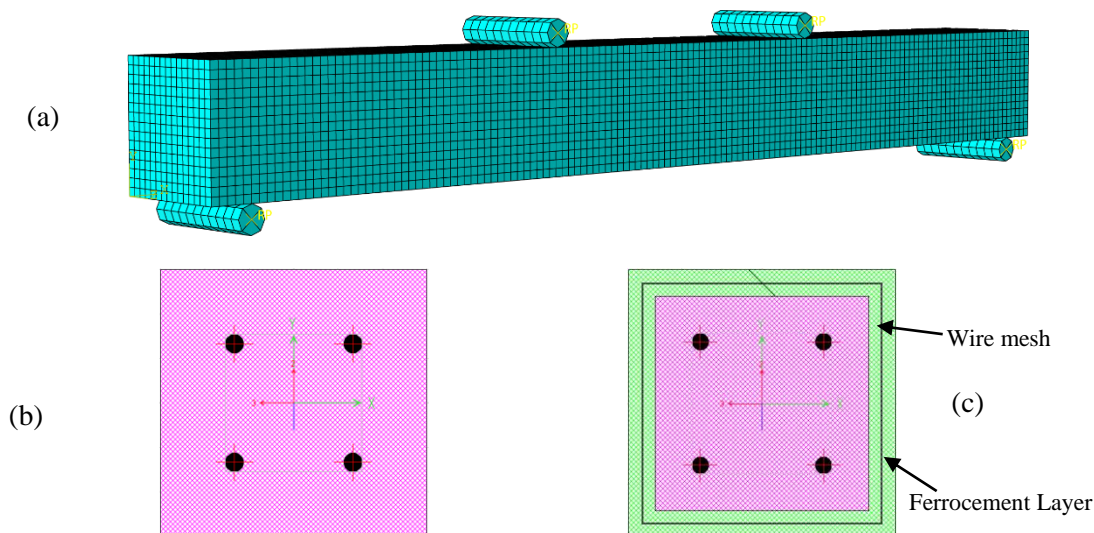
A typical model of beam generated via FEM software: (a) the 3D view of beam, (b) un-retrofitted beam section, (c) retrofitted beam section.
